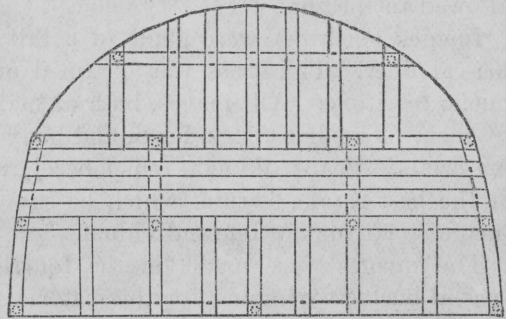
Schematic drawing showing arrangement of posts, roof beams, and semicircular arrowweed wall of structure used in image ceremony
